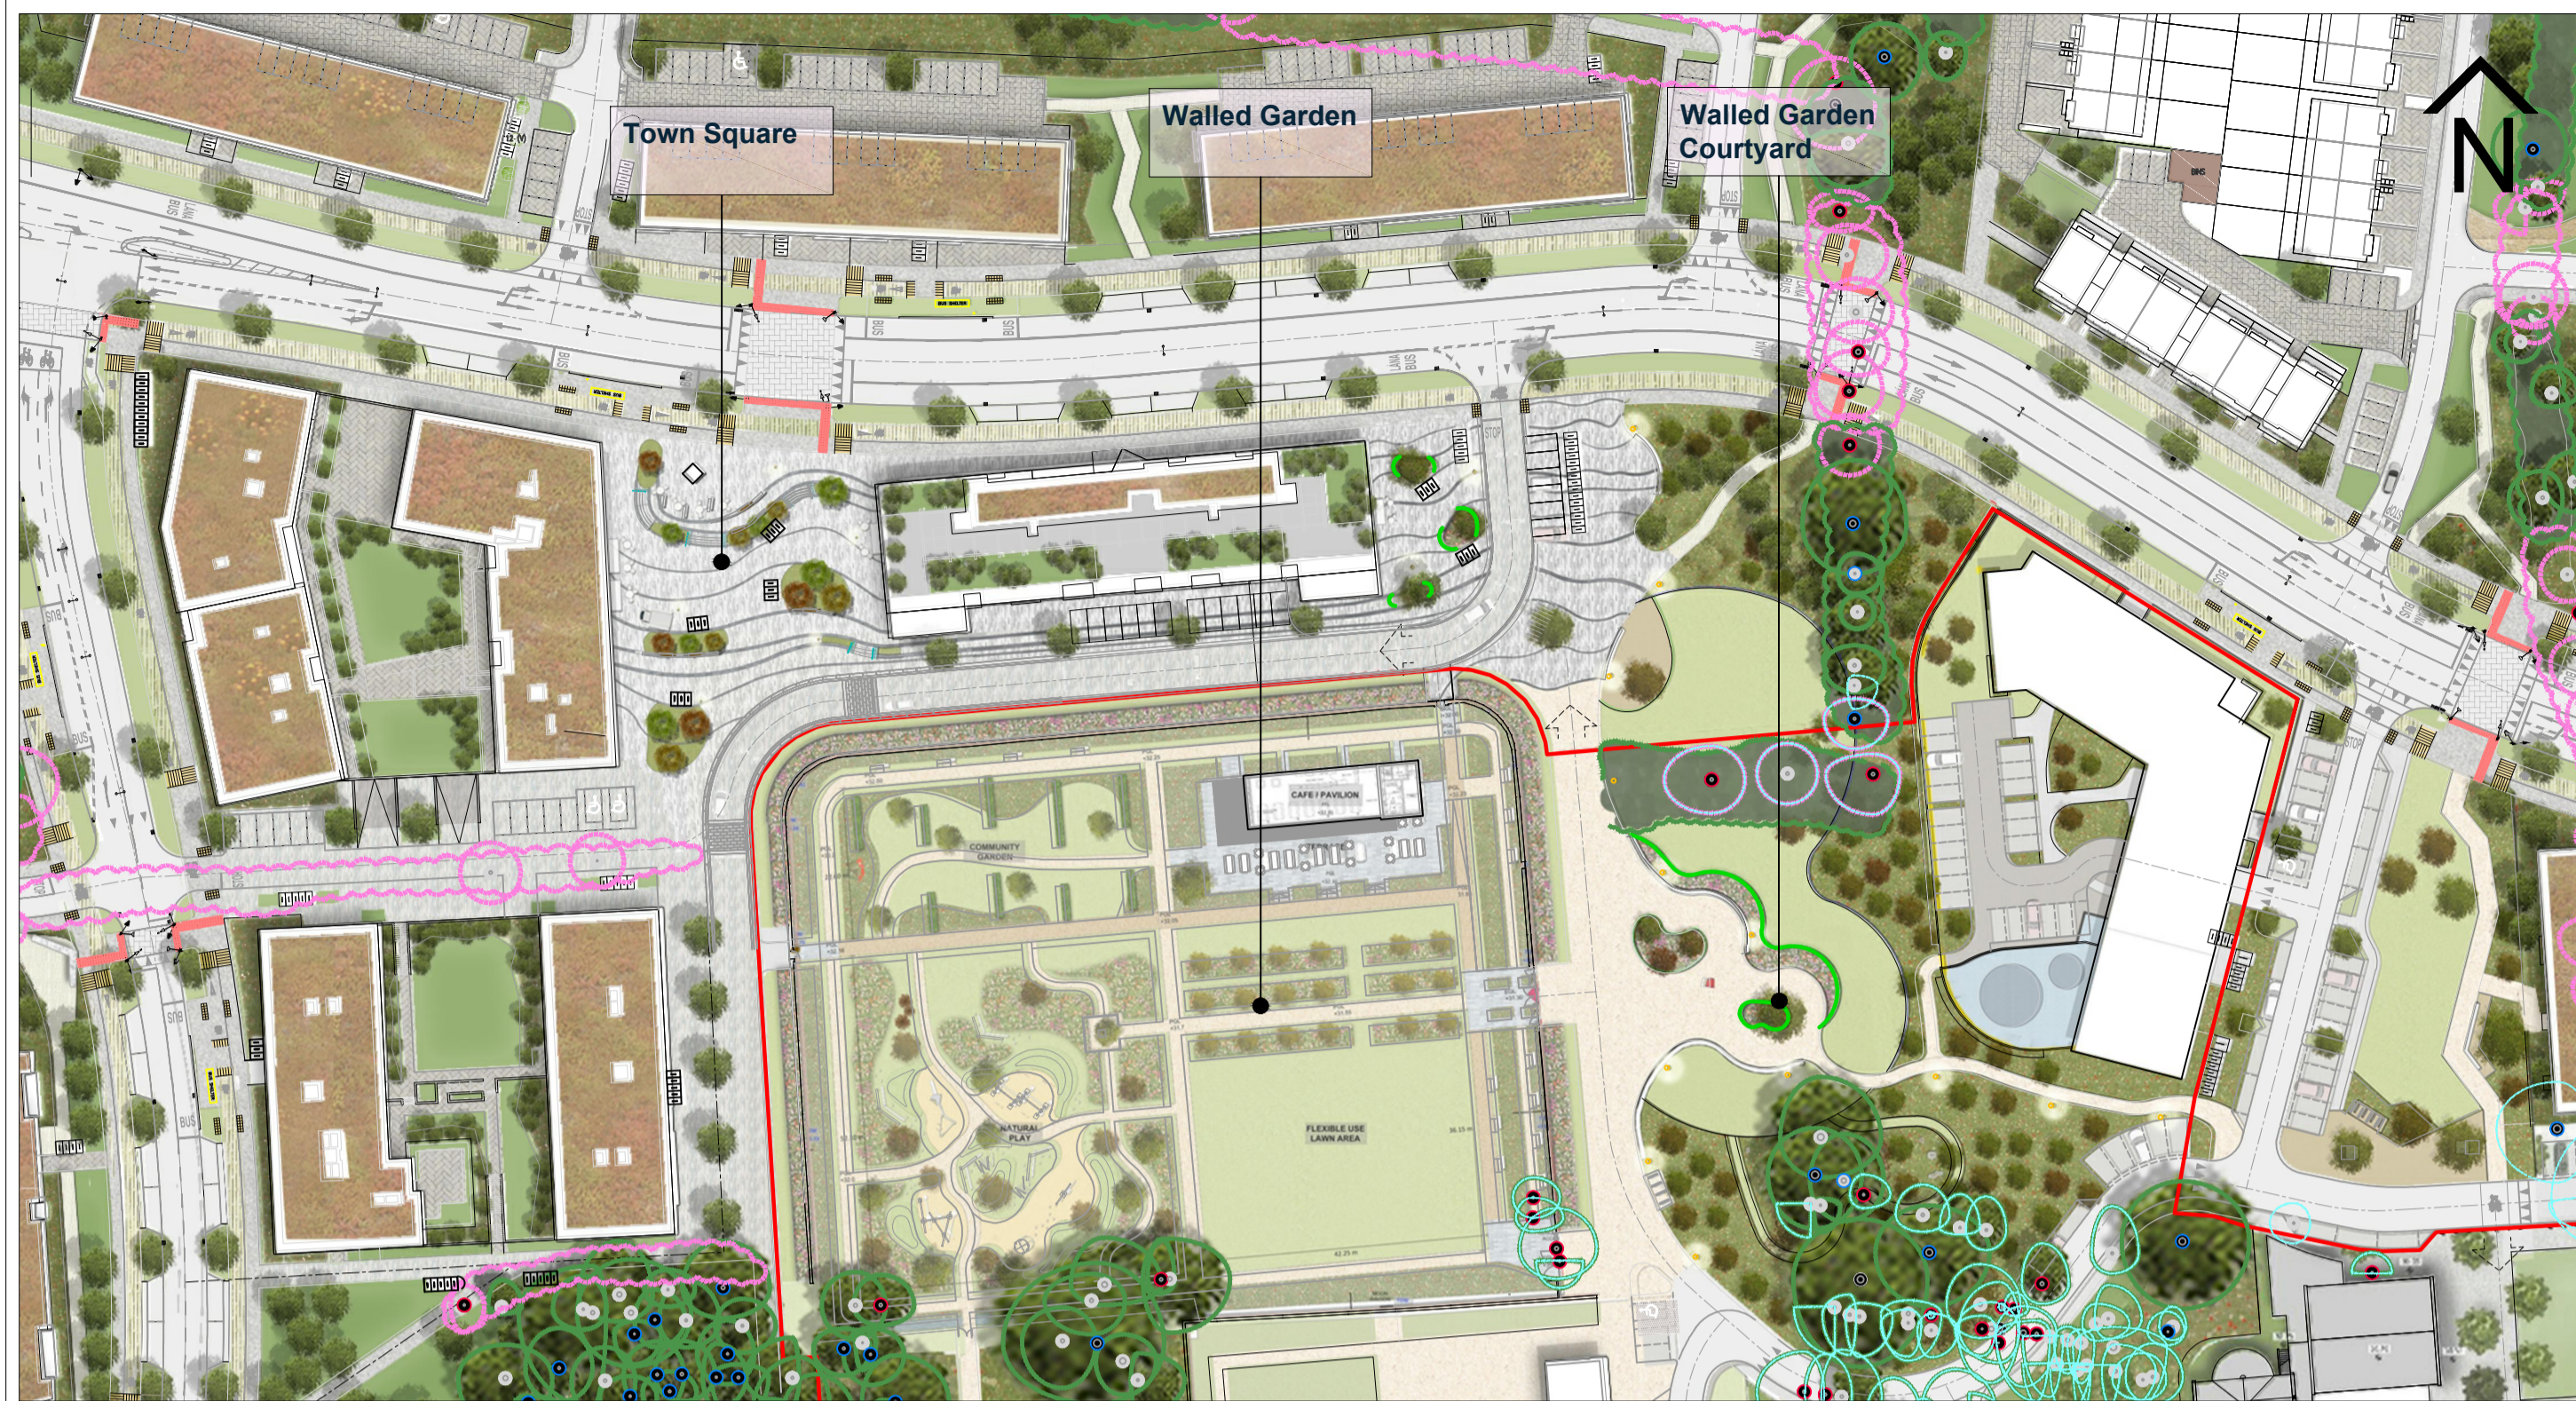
(Scale 1:1000 @ A1)
